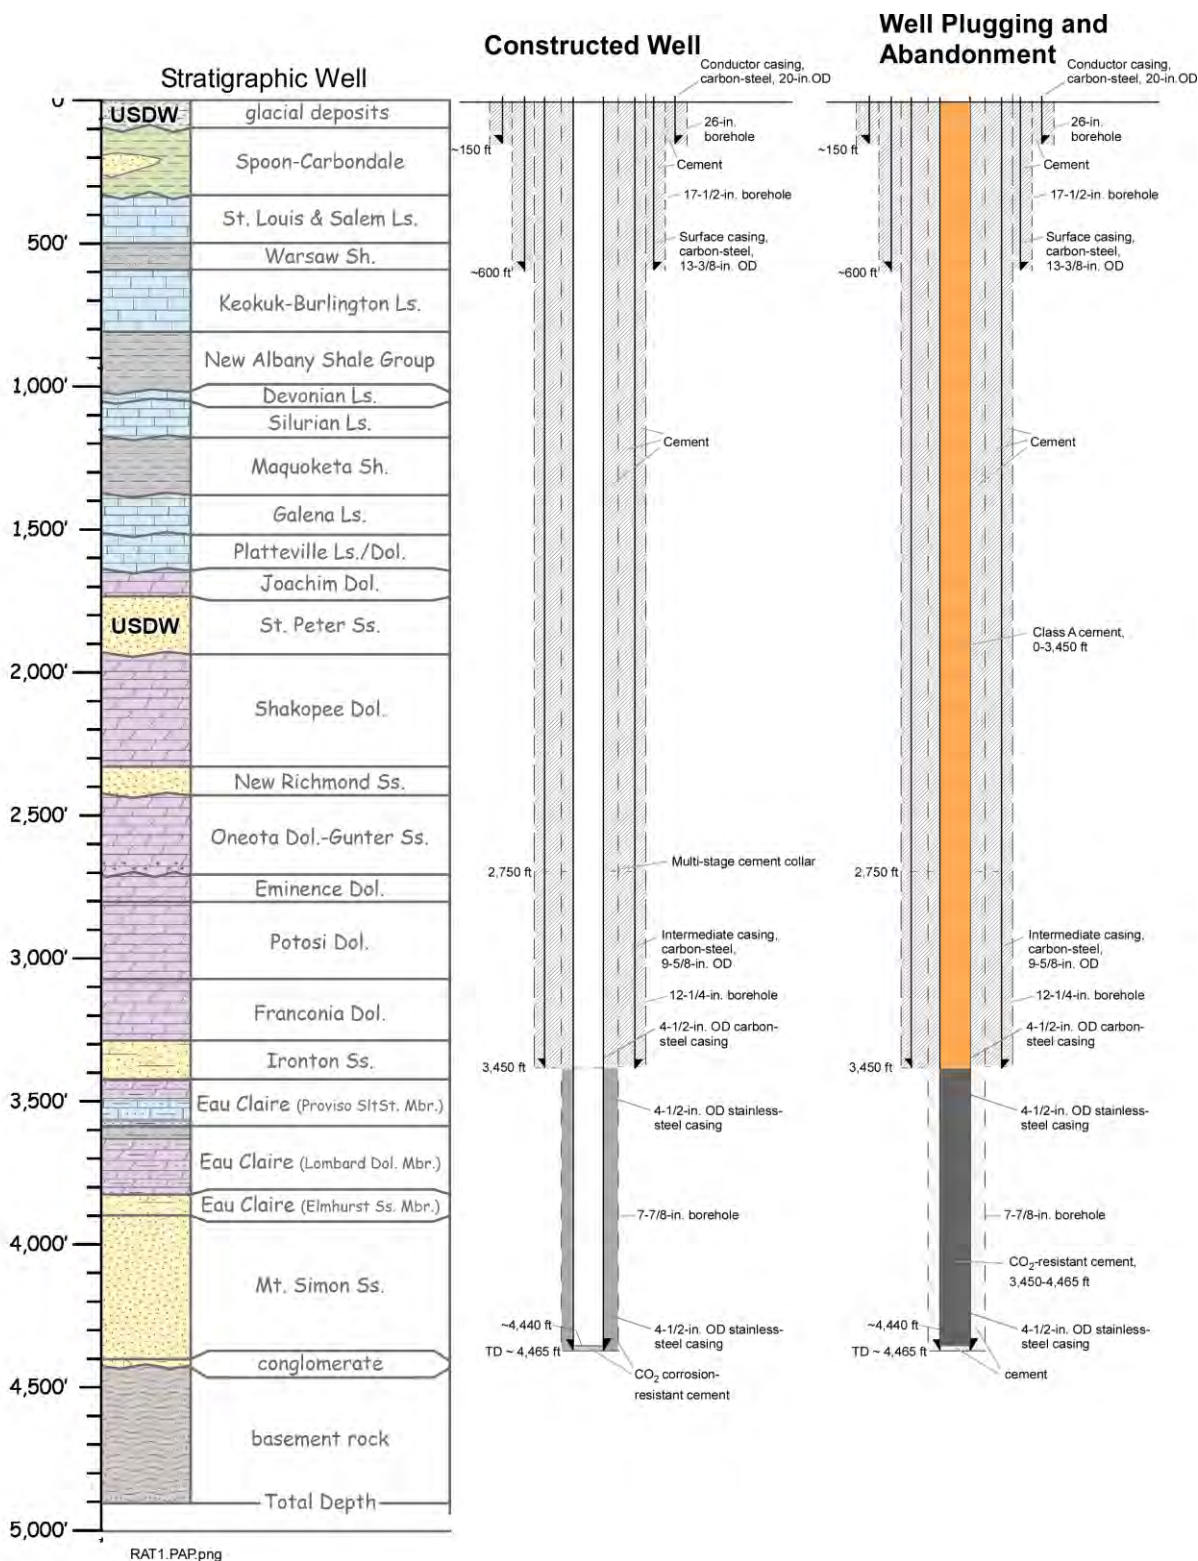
Construction design and plugging and abandonment plan for the reservoir access tube wells.
